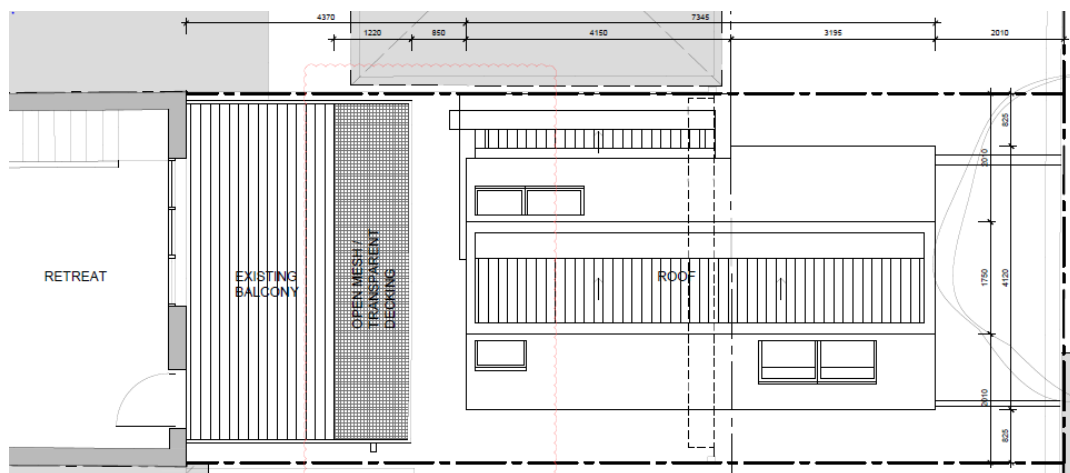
Sketch plan showing 0.85m separation and mesh flooring to balcony.
